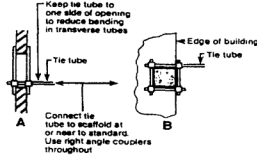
Box tie. A. Vertical or horizontal section through wall
